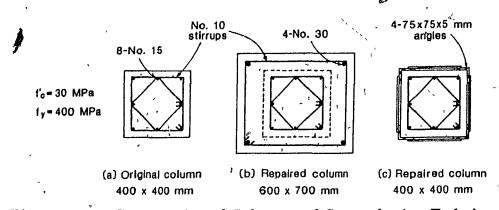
Cross-section of Column and Strengthening Techniques.
